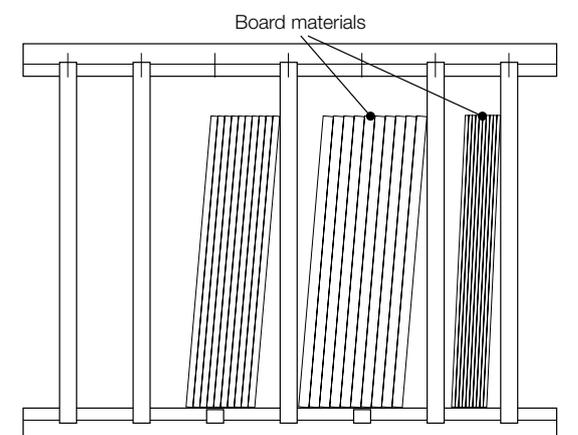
Wooden sheets/boards placed in a purpose-designed storage rack
